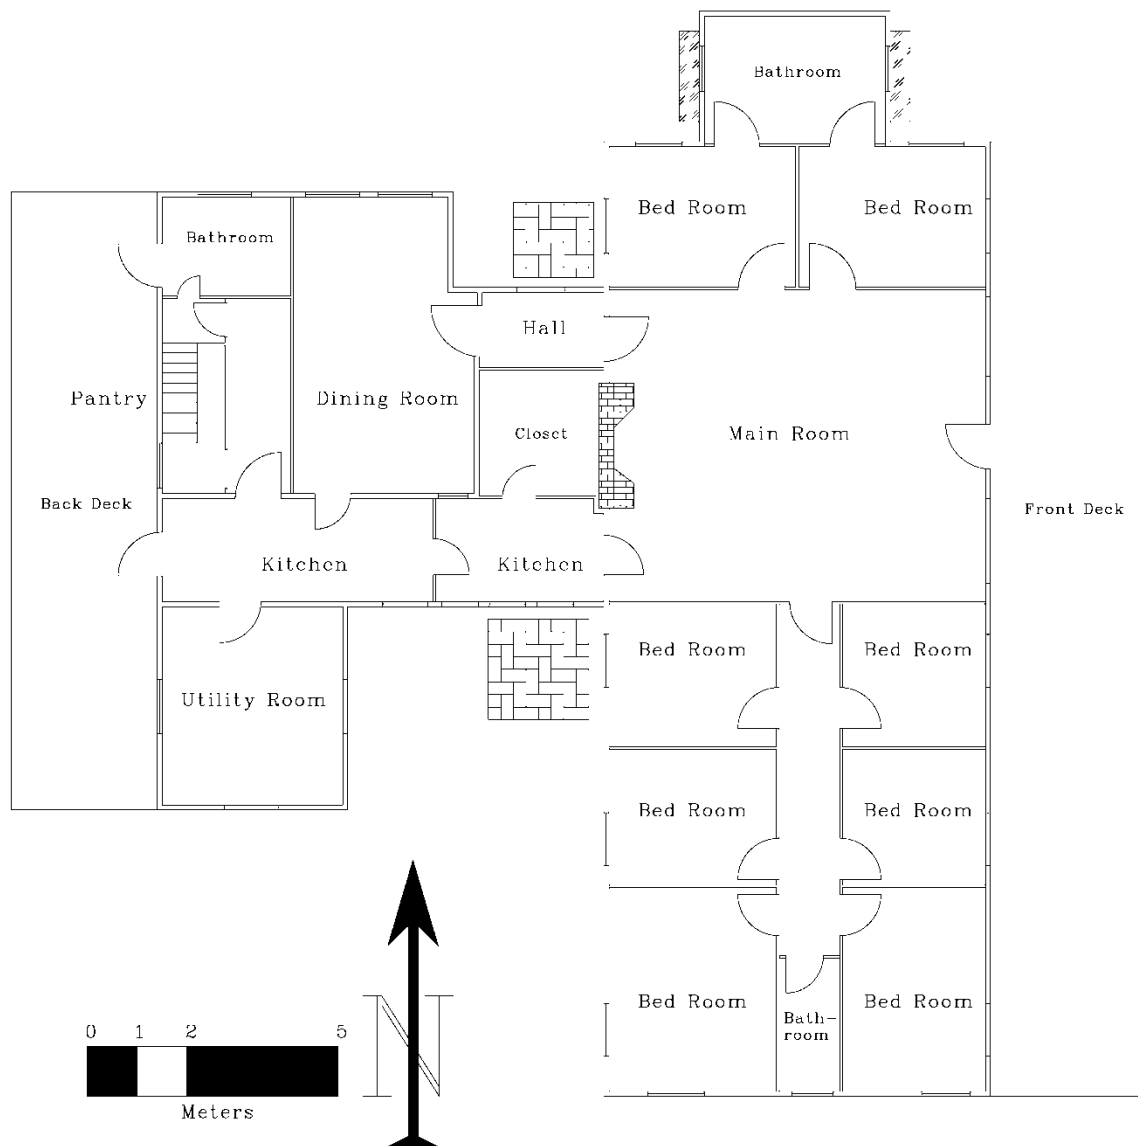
Proposed floorplan for the Hunt Club Lodge's fourth and final construction phase. A new bathroom has been constructed at the northeast corner above an existing cistern. Another bathroom has been added to the hallway in the southeastern corner. The northwest gun room has been converted into a servant's bathroom. The front and back decks have been constructed along the eastern and western elevations, respectively.
